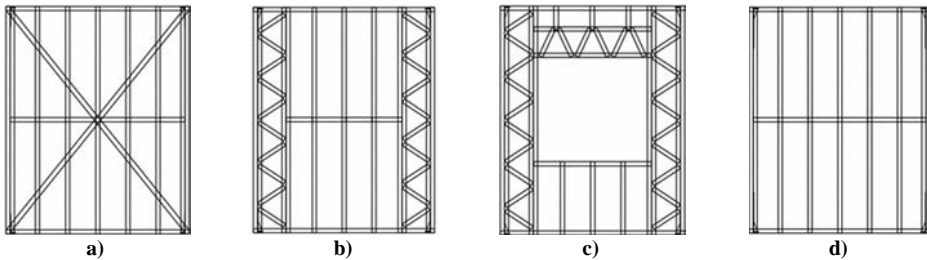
Configuration of the metal framings analysed: a) studs and diagonal flat bracings; b) studs and truss bracings at each end; c) truss framing and opening for window; d) studs only, without bracings.
